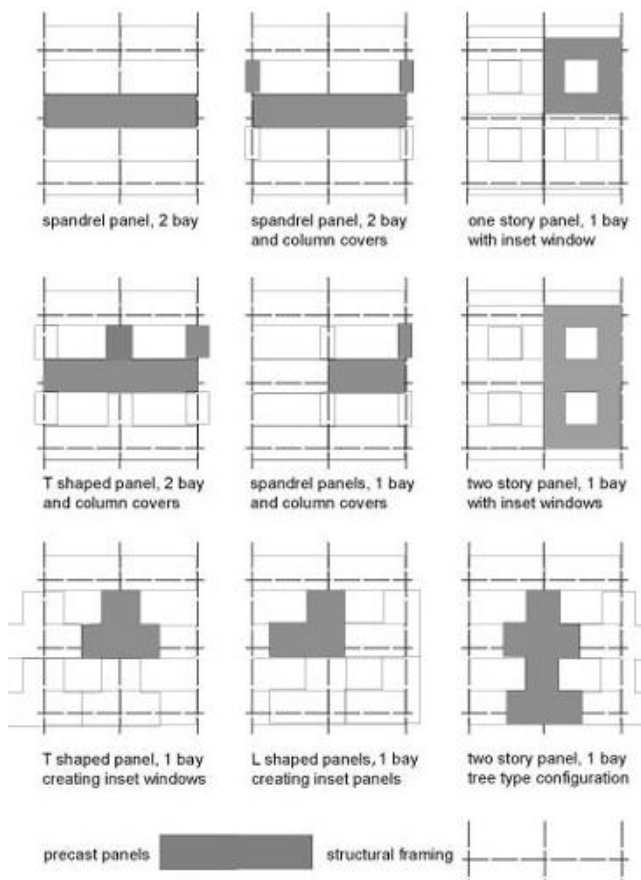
Panel façade layouts, including some designed to reduce the number of panels and connections (Chris Arnold et al, 2009)
